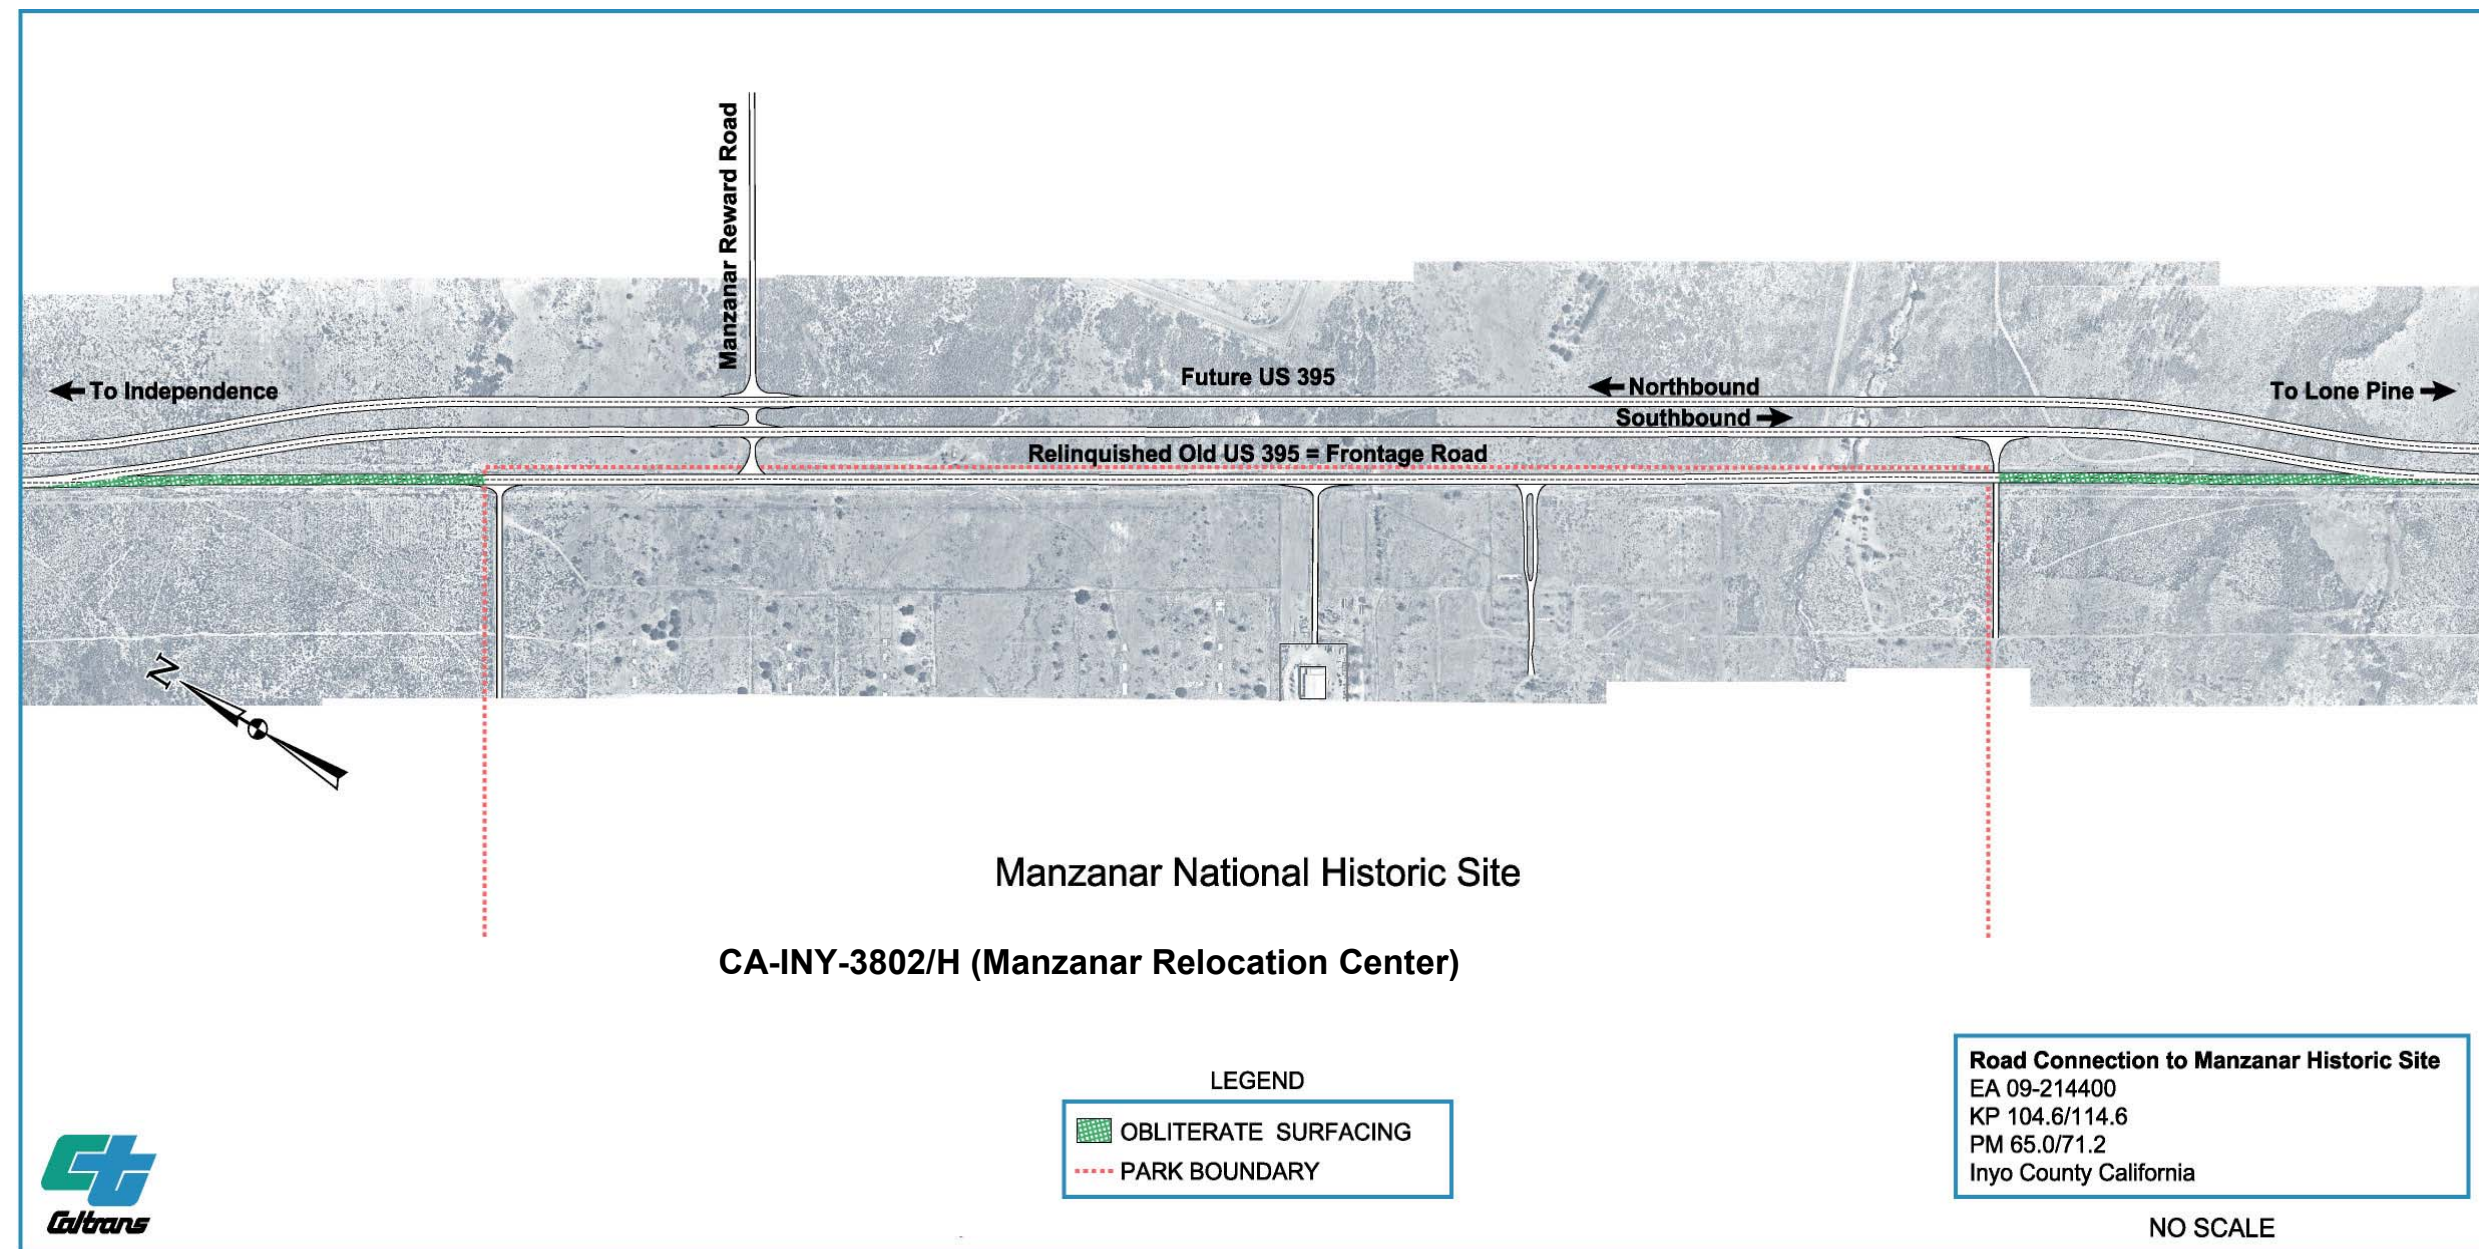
Proposed Road Connection to Manzanar National Historic Site (Alternative 2)
